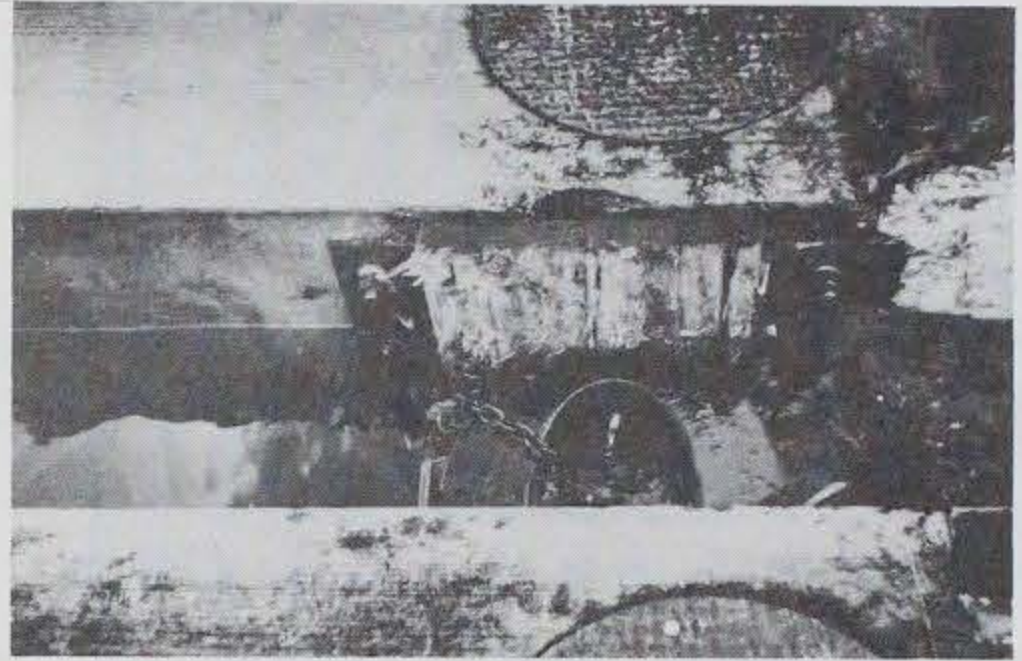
Photo depicting worn condition of soft fir bumper plates after 2 months.
